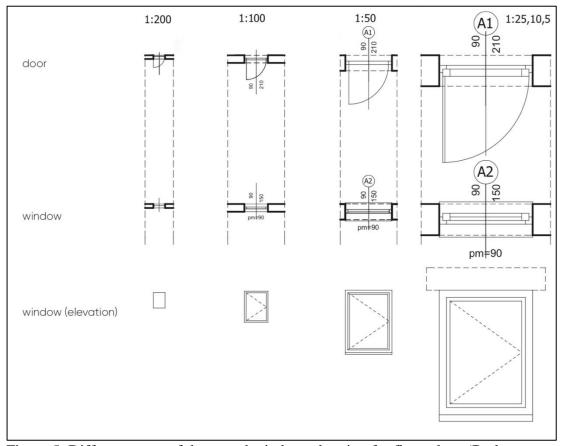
Different types of doors and windows drawing for floor plans (Budapest University of Technology, 2017).
